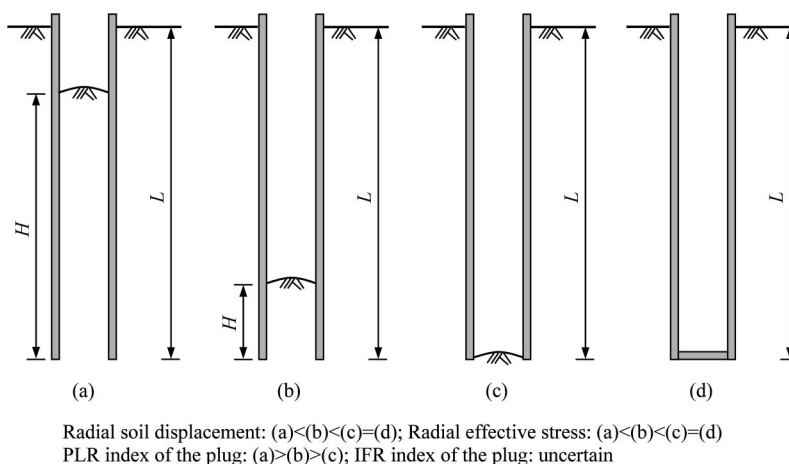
Schematic showing the phenomena of soil plugging and soil squeezing: (a) open-ended pile, higher elevation of plug, unknown plugging mode; (b) open-ended pile, lower elevation of plug, unknown plugging mode; (c) open-ended pile, no elevation of plug, plugged mode; (d) closed-ended pile, no elevation of plug, full-displacement mode
